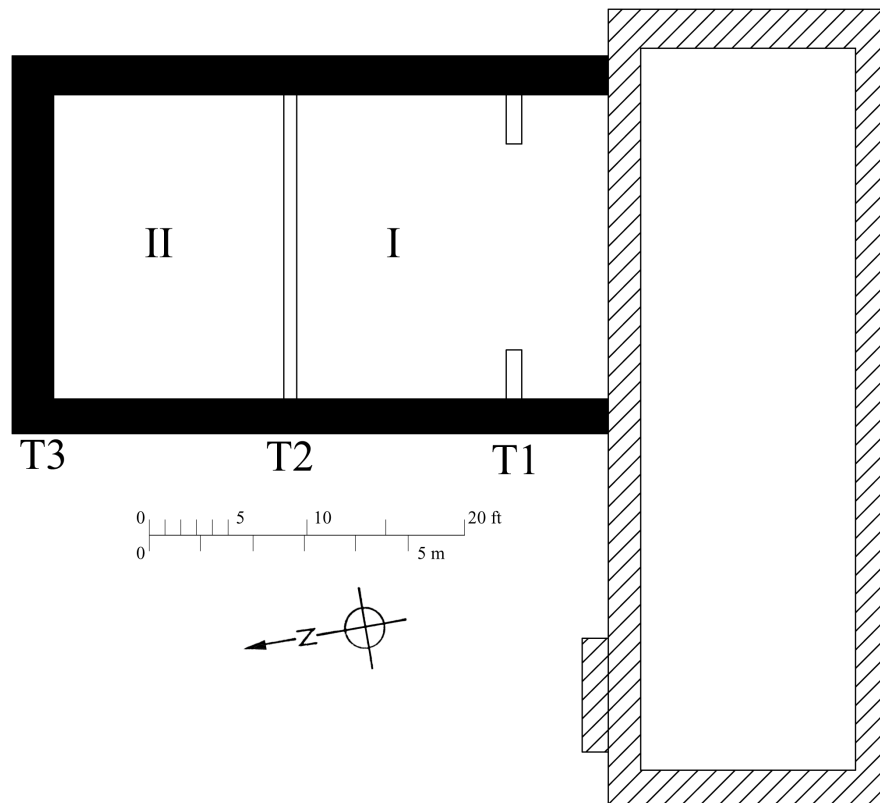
Outline plan showing truss and bay numbering (after Nick Hill).
